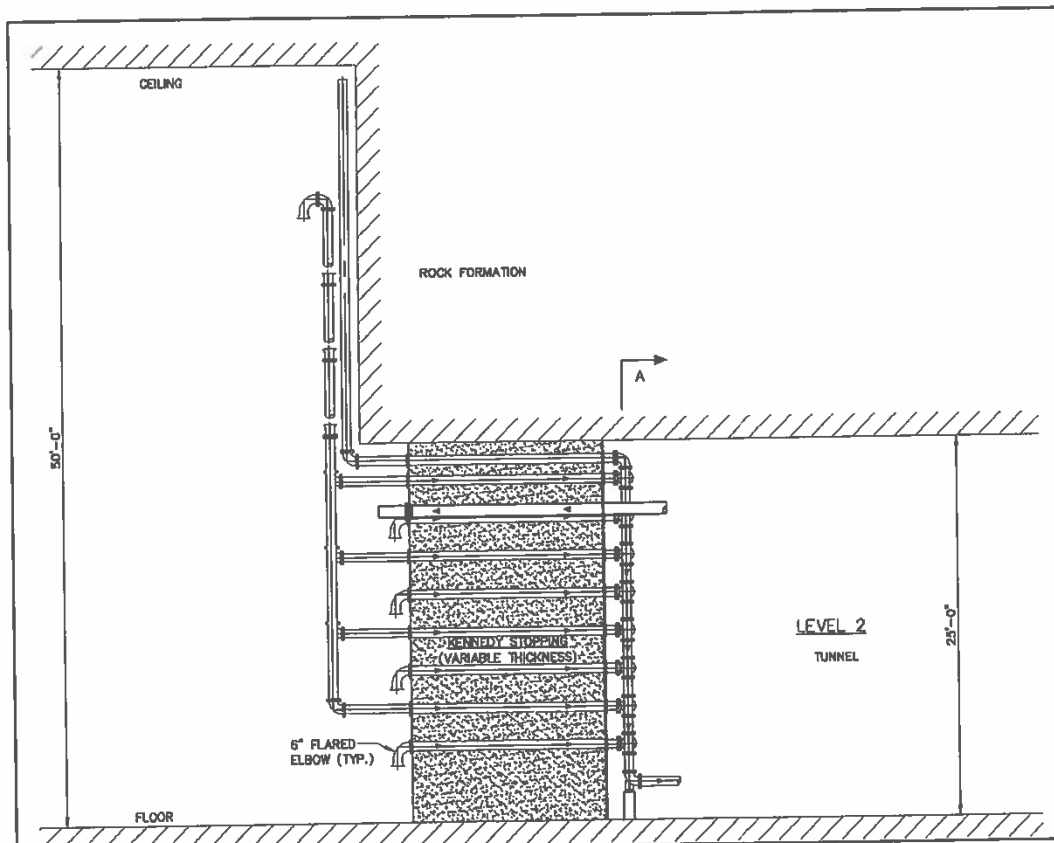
Typical bulkhead with supernatant extraction piping
